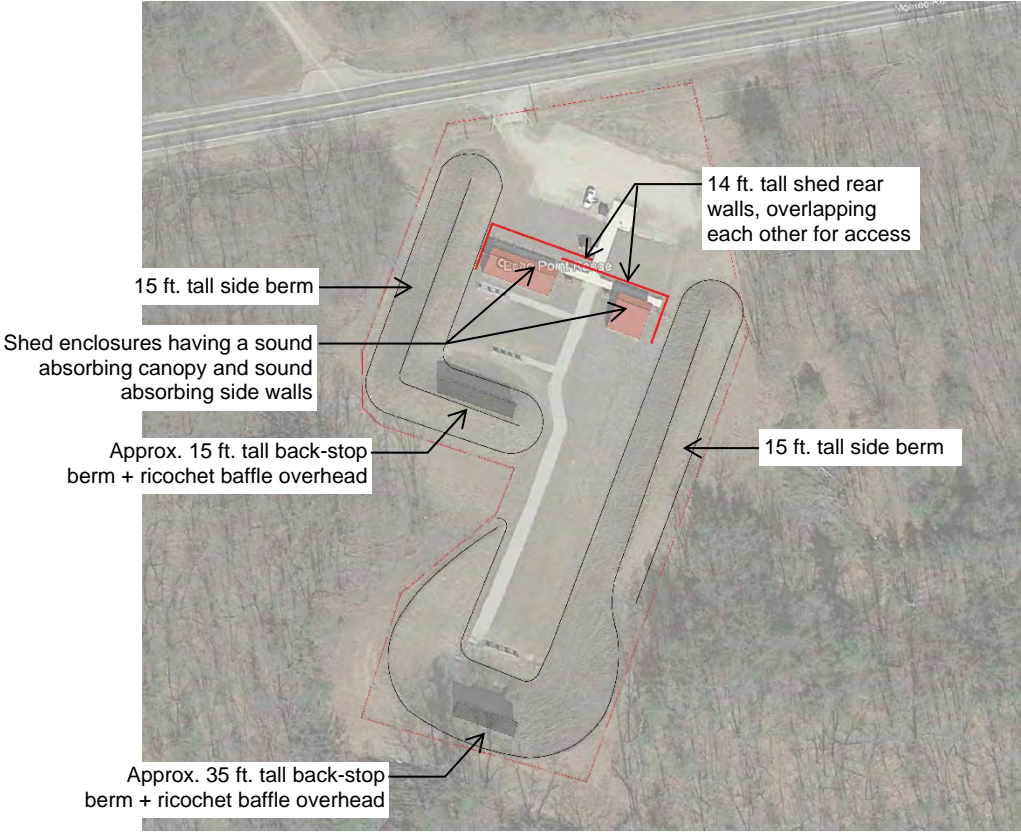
Concept plan diagram of the base range with a 14 ft. tall noise barrier wall behind the sheds | Model G
